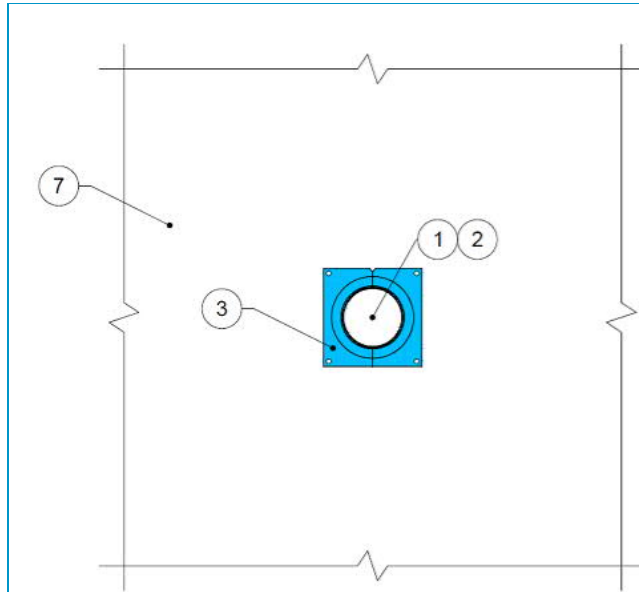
Plastic pipe with PROMASEAL® FC 40 – 150 collars (floor underside plan view)
